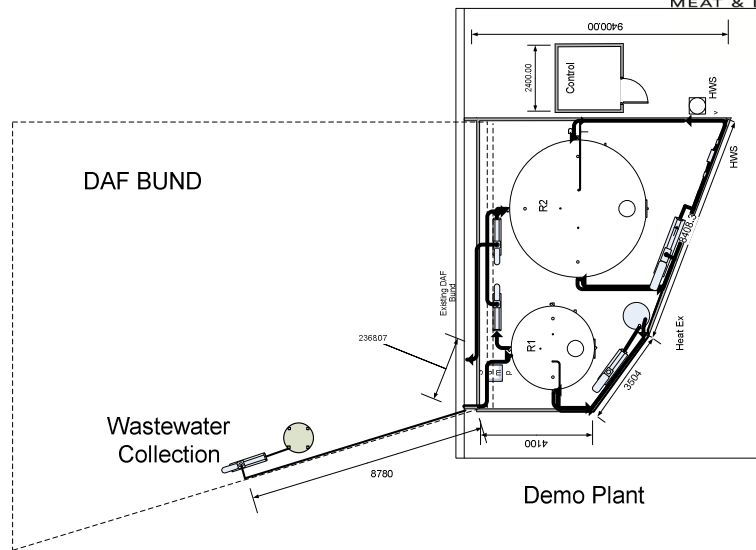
Layout of wastewater handling system within demonstration plant host site in 2011.
